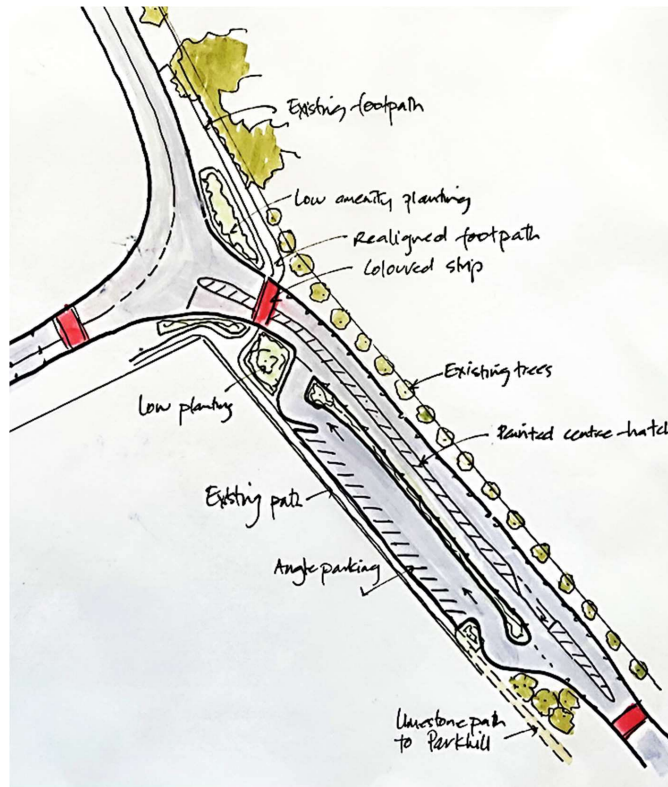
Proposed Increased Parking on Raymond Road for School and Kindergarten
